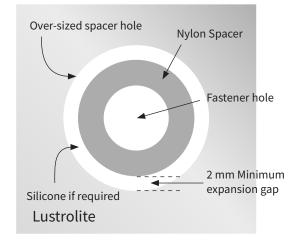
Hole Layout for Spacers and Fixture Fasteners
